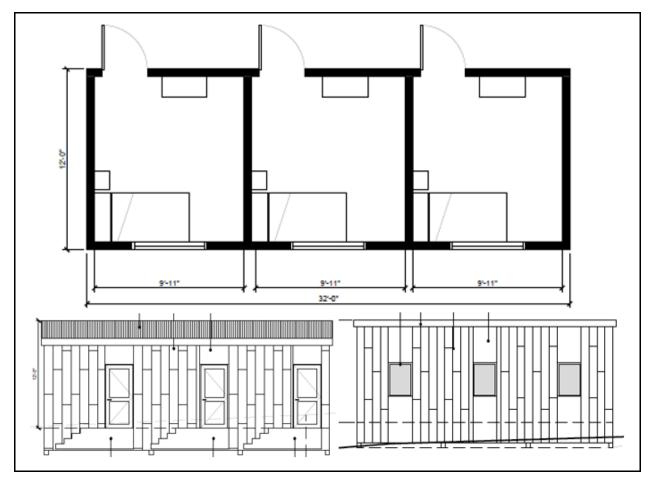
Proposed Bunkhouse – Floor Plan and Elevations
